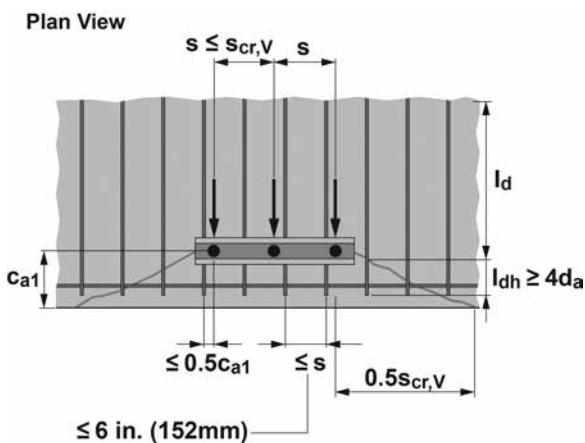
Requirements for detailing of anchor reinforcement of anchor channels
